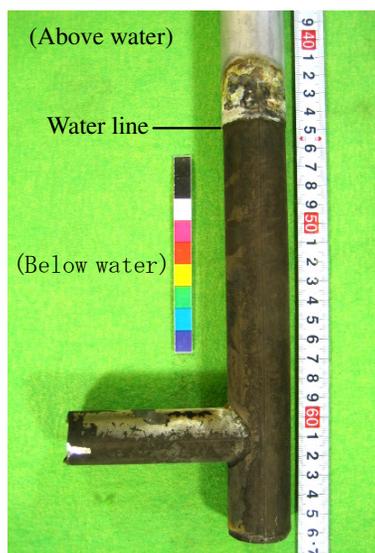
State of corrosion of handrail in bathtub No. 3, About 12 months use
